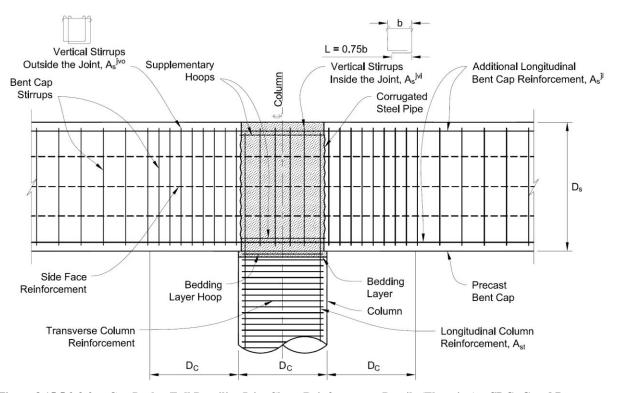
Cap Pocket Full Ductility Joint Shear Reinforcement Details (Elevation)—SDCs C and D
